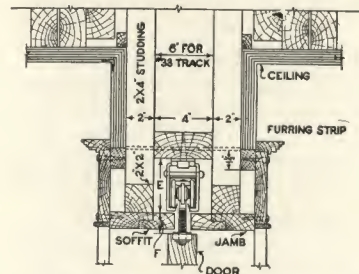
Cross-Section showing typical Overhead Construction for Supporting Track.
